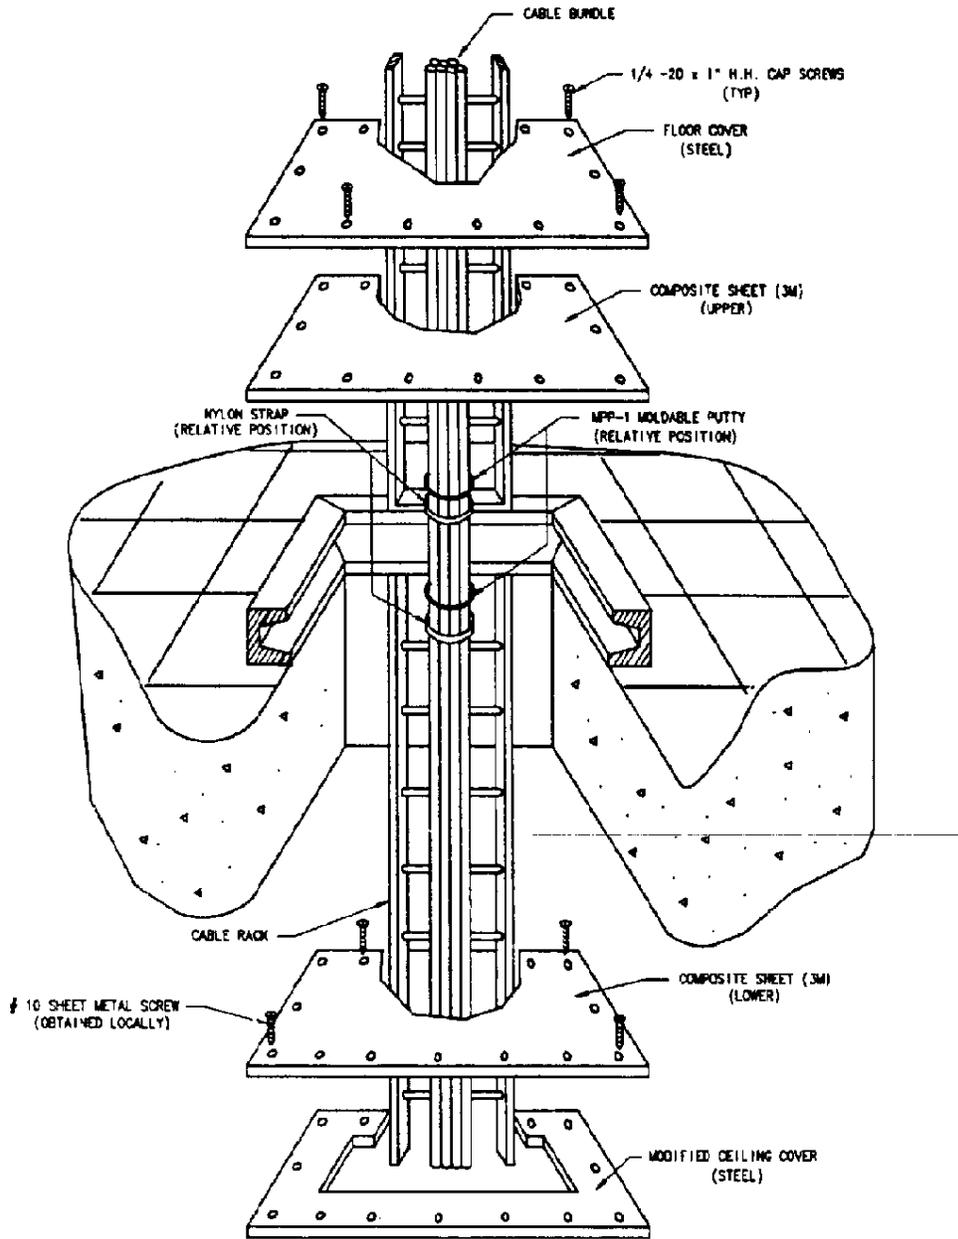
Exploded View of Cable Opening - Floor/Ceiling
